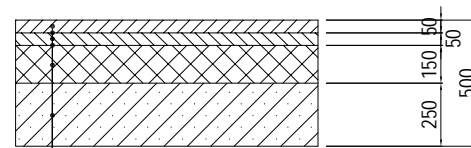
DETAIL OF ASPHALT CONCRETE PAVEMENT S=1:30
